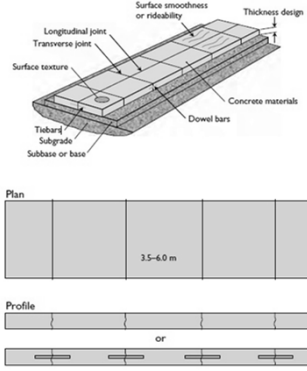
Jointed plain concrete pavement (JPCP) (courtesy: ACPA).
